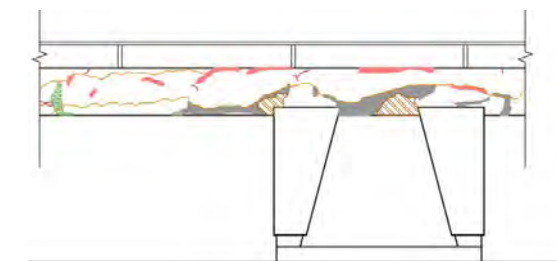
Bridge west elevation condition mapping (Source: created by authors)
